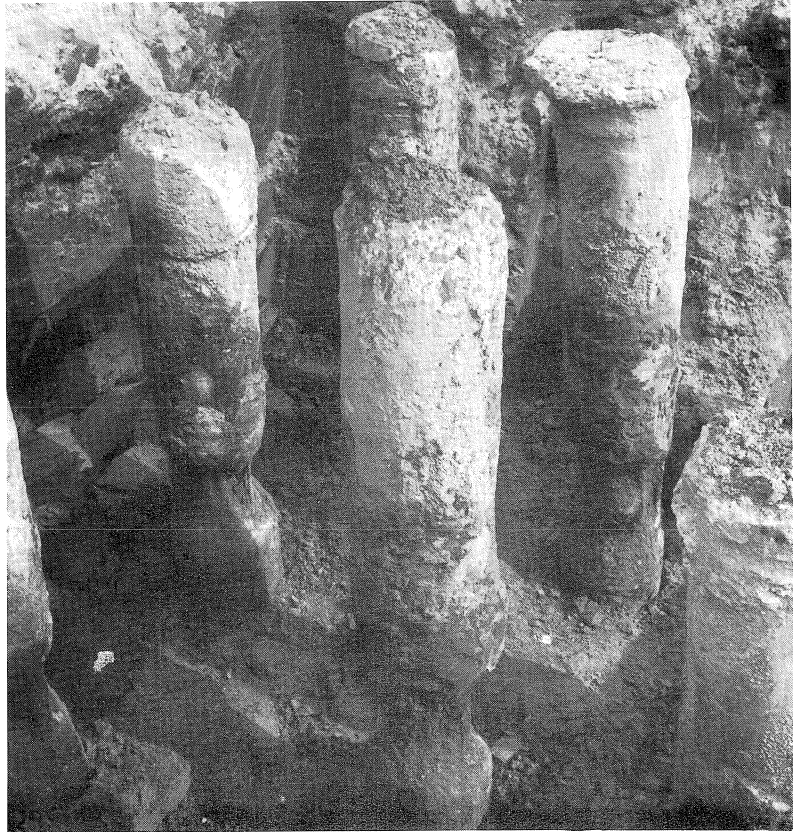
Excavated cast-in-situ piles with locally decreased cross-section.
